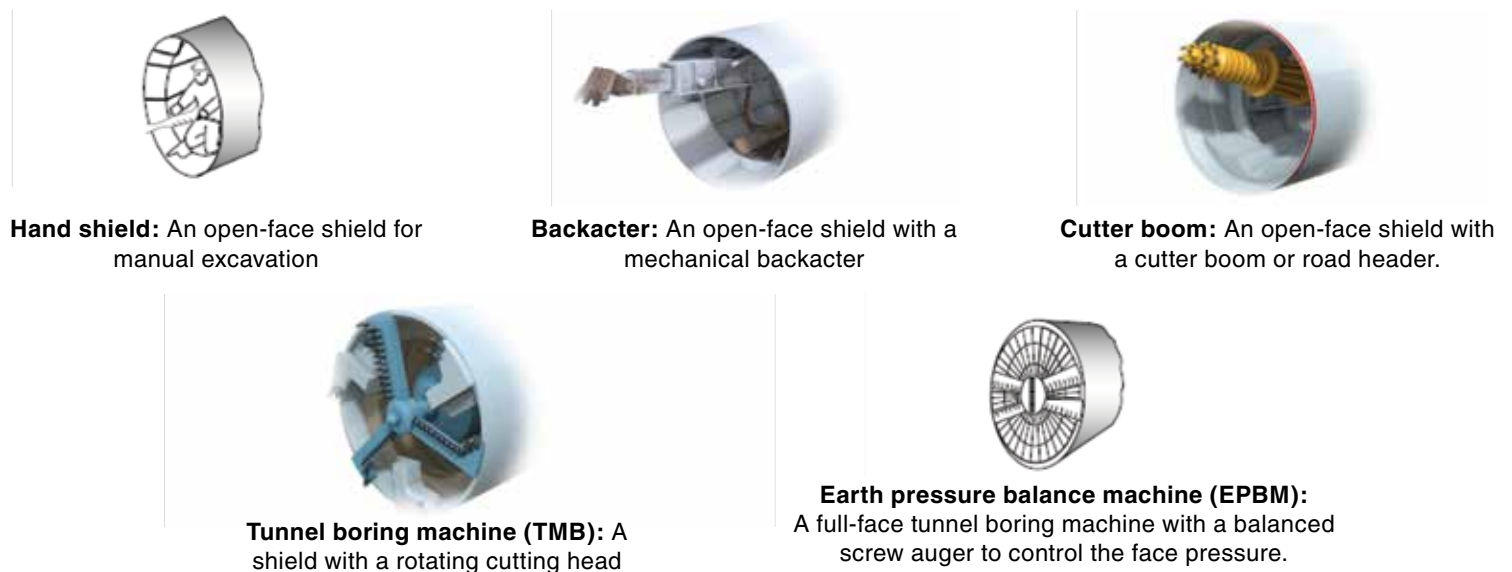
Tunnel boring machines and excavation techniques. (Iseley and Gokhale, 1997)
